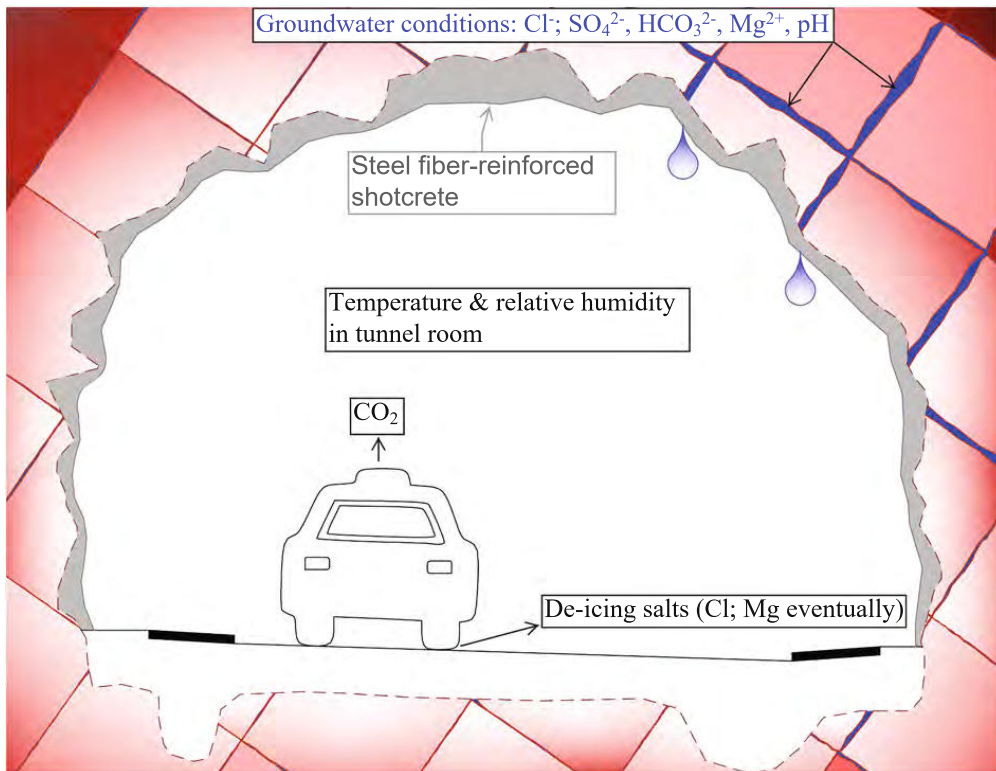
Potential sources of aggressive elements for steel fiber-reinforced shotcrete installed in road tunnels without any inner lining.
